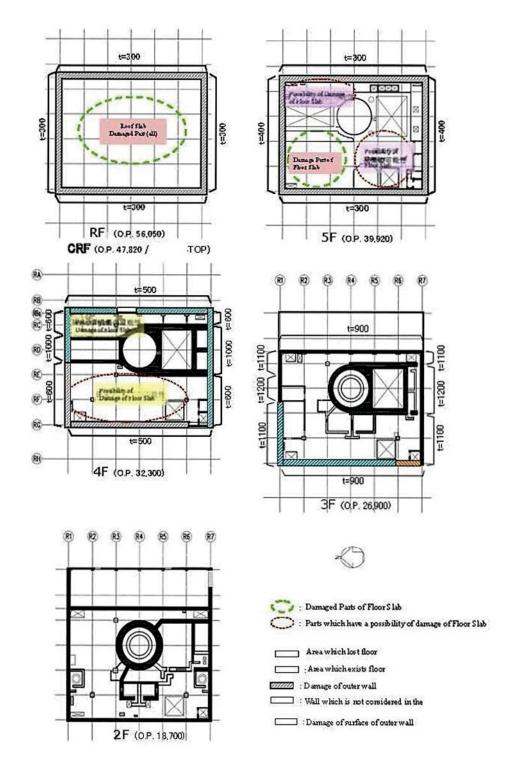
Damaged areas on 1F3 reactor building floor plan. (Courtesy of TEPCO, [129])
